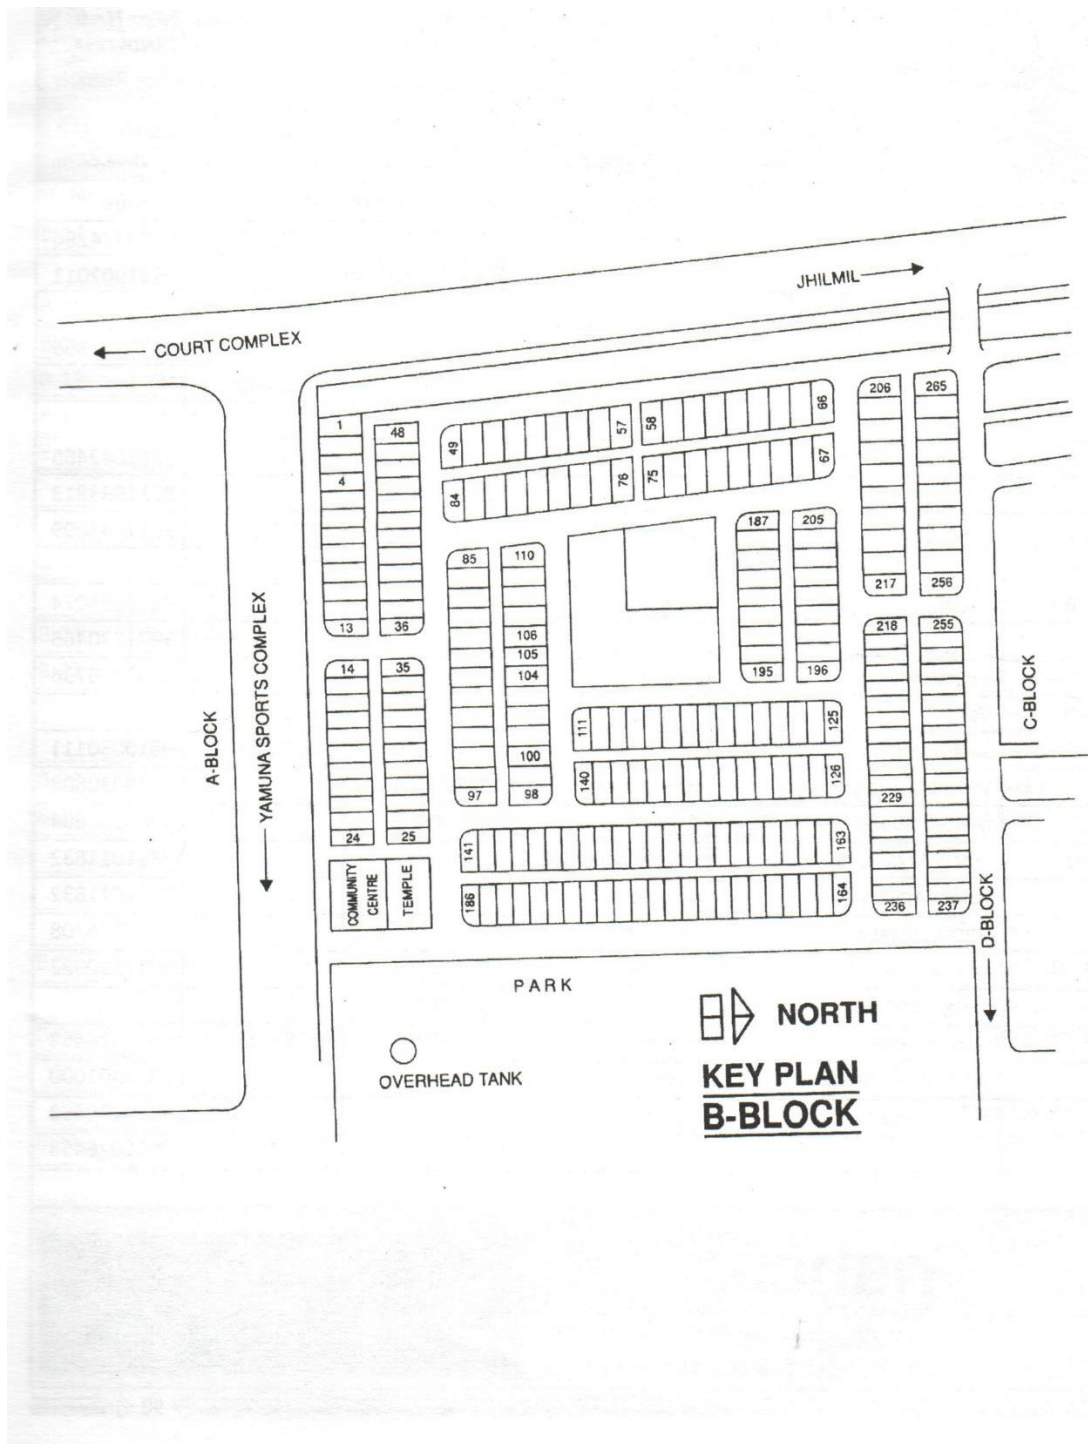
TYPICAL LAYOUT PLAN OF SURAJMAL VIHAR(B-BLOCK)
